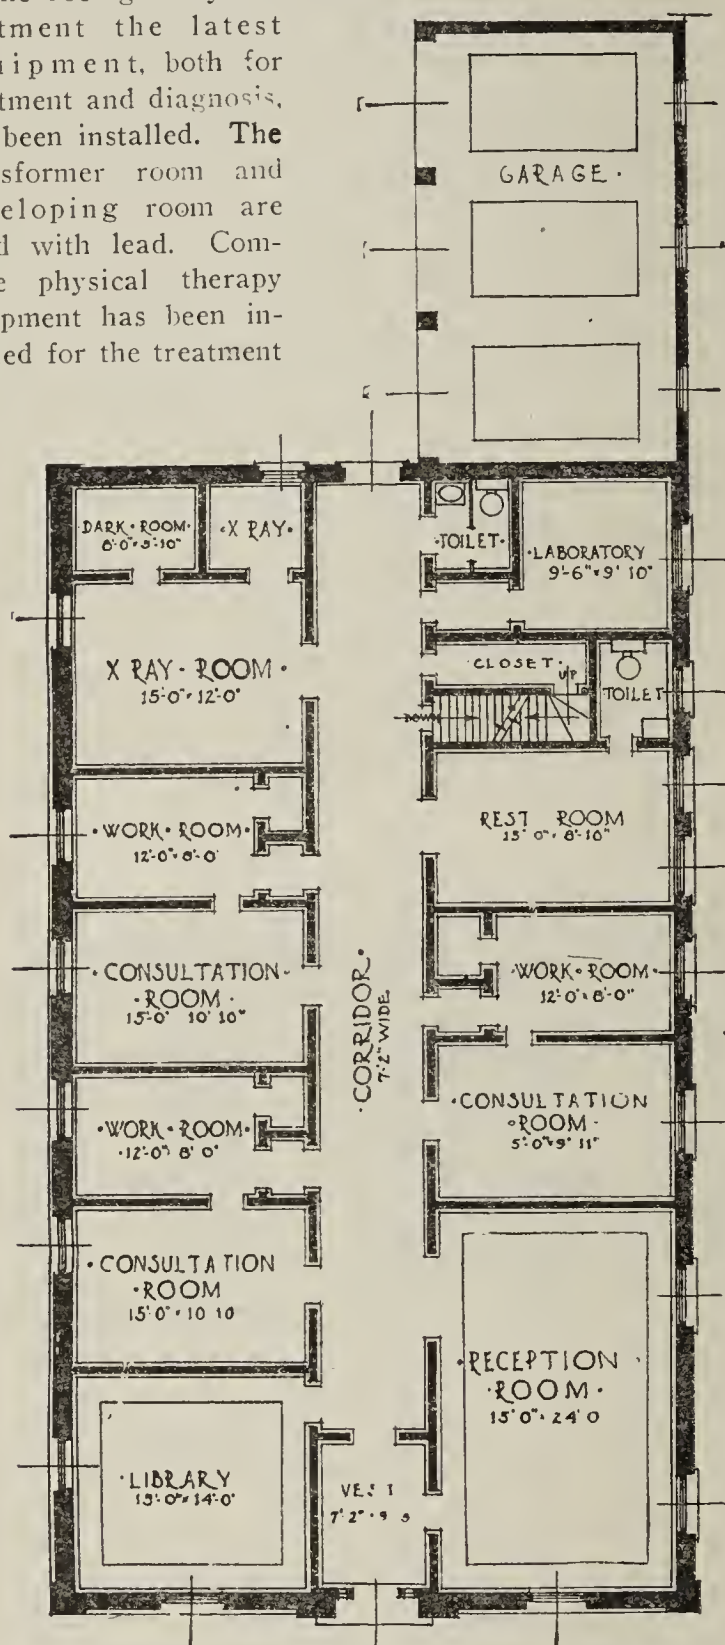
First floor plan, 40 by 72 feet, including garage.
